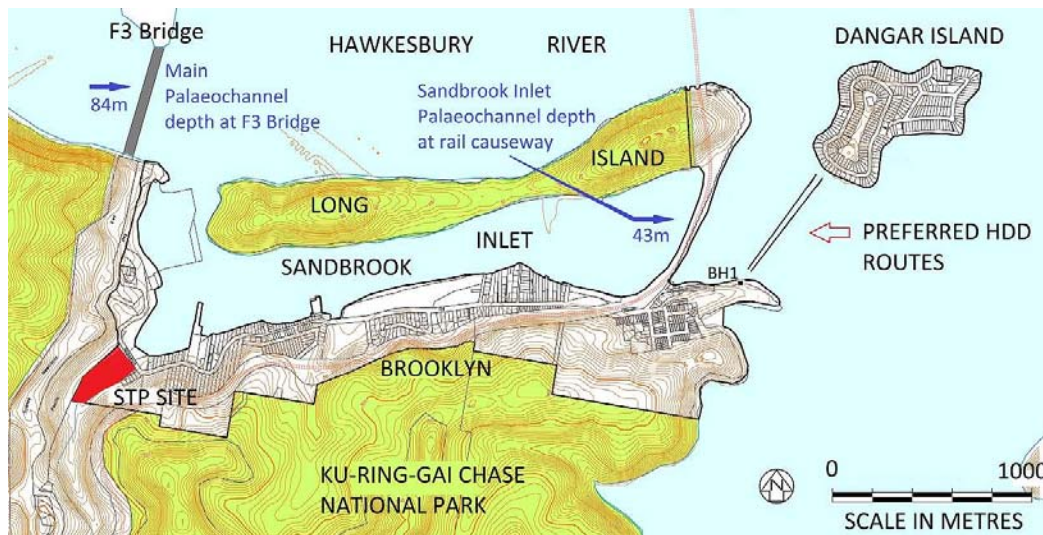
Site Plan with proposed Waste Water Transfer Main Crossings from Brooklyn to Dangar Island.
